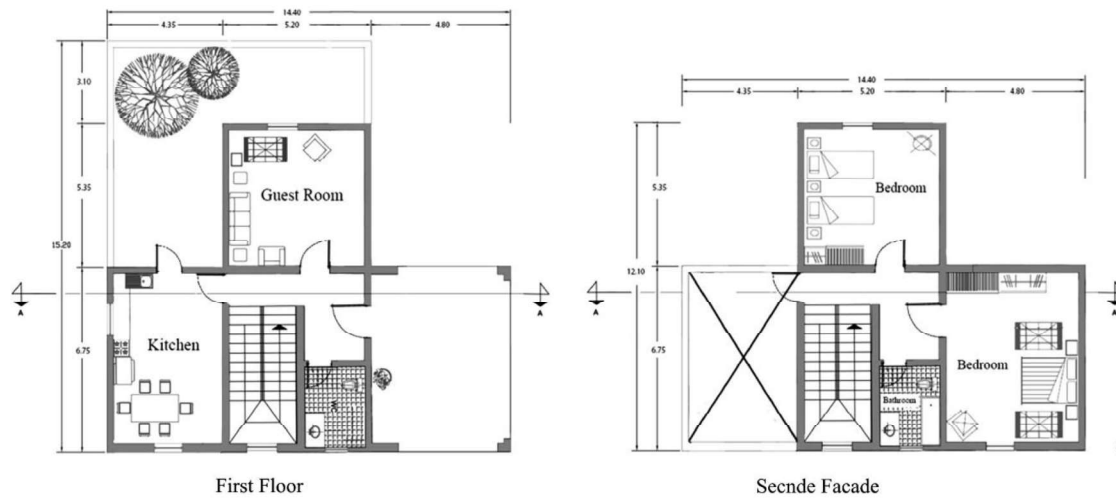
Plan and sections of the Modern house in Ghadames(Eltrapolsi, n.d.)
